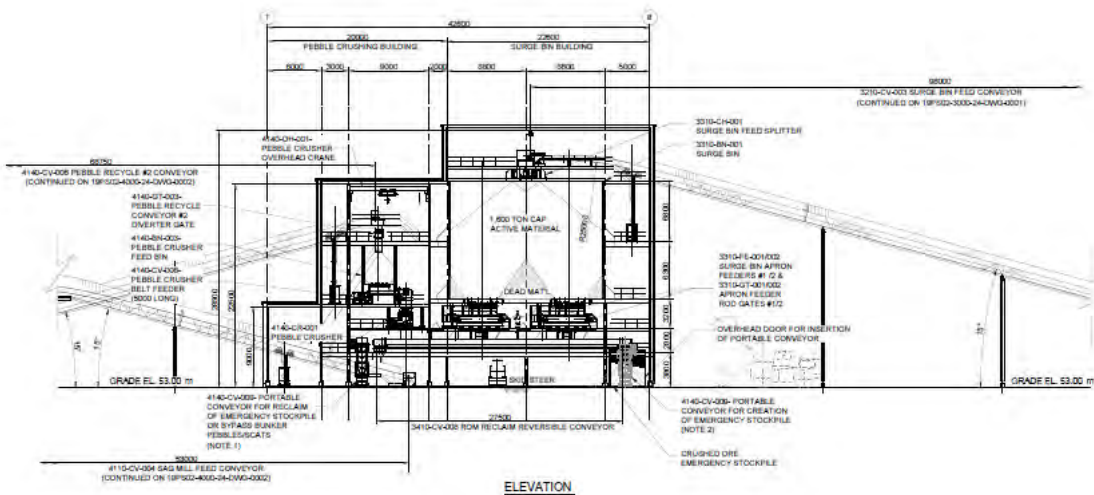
Combined Surge Bin & Secondary Crushing Building Elevation View
